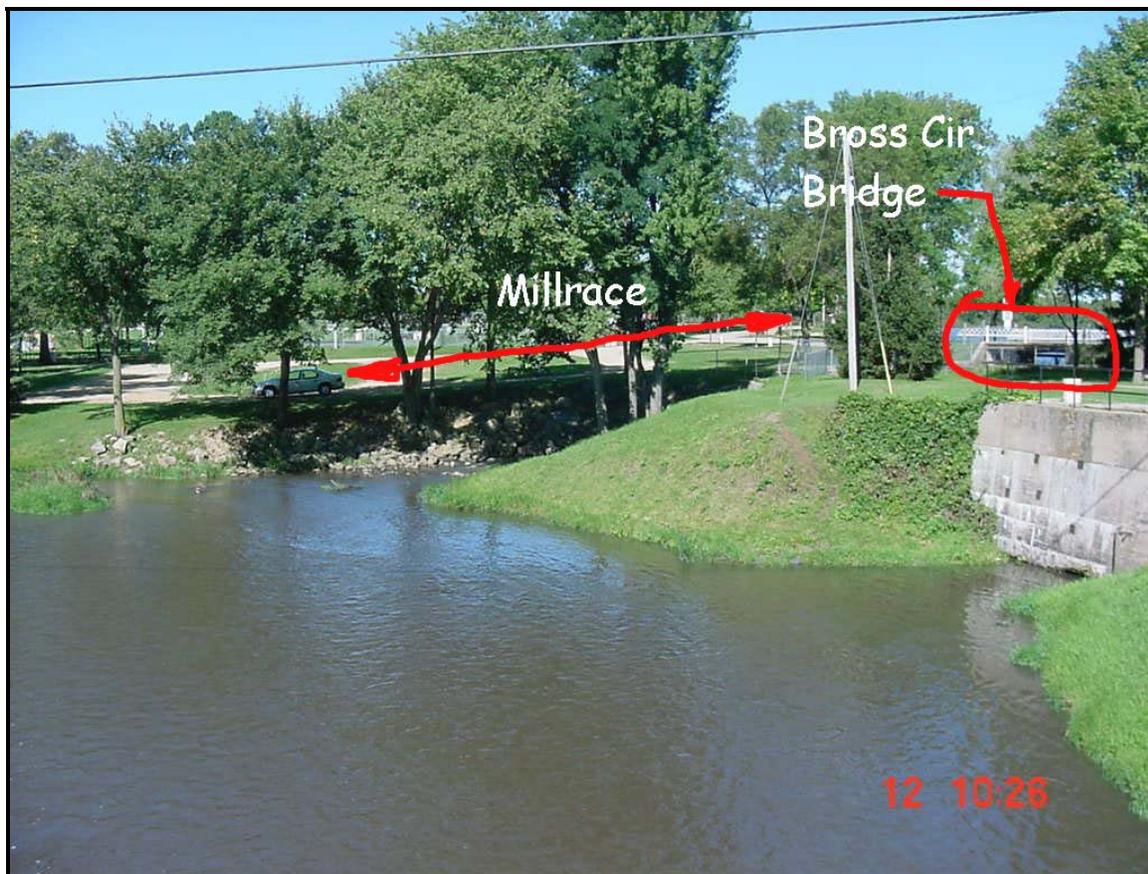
View of millrace and Bross Circle Bridge from S.T.H. 69 bridge.
